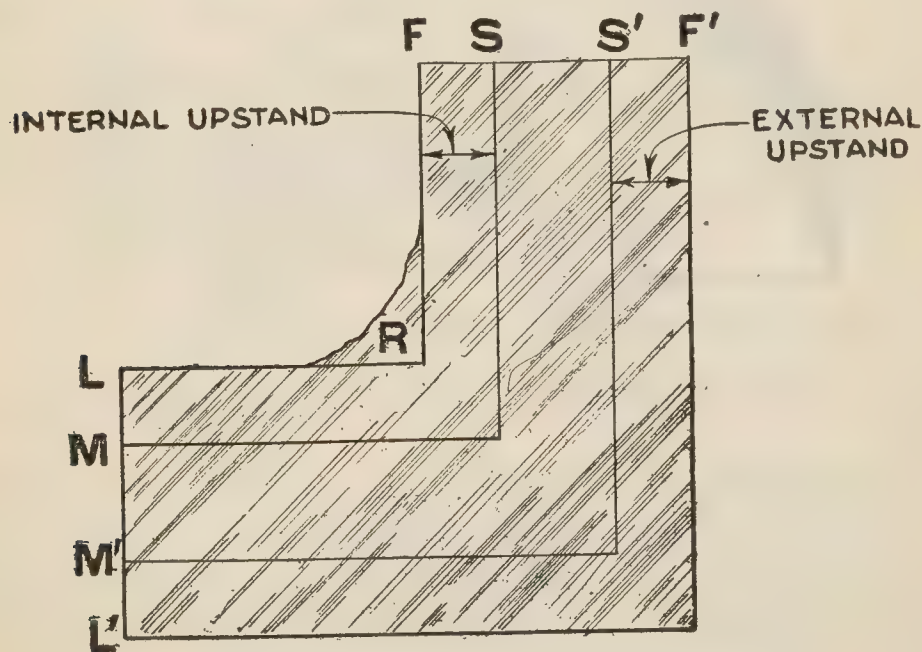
,544.—*Beating box gutter corner, 1.* Sheet marked and cut preliminary to beating.
